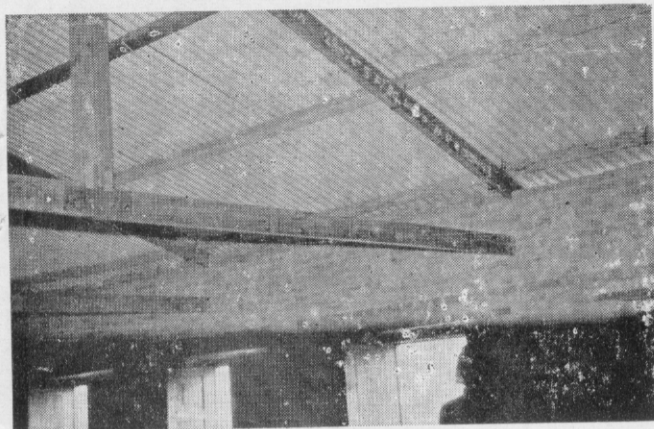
, 17 Primary School at Banepa, Nepal. Brick walls steel channel truss, aluminium sheeting, trusses built into wall, on partitions, several classes in same room.
